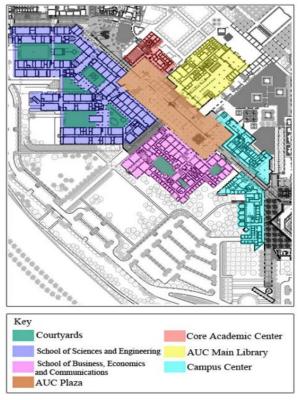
Master Plan of Zone B, AUC Campus, New Cairo
